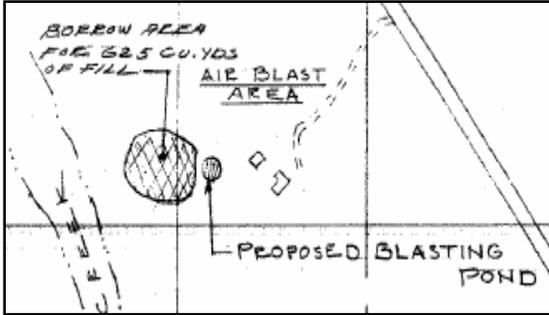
Air Blast Pond layout as depicted in 1998 RFI/VI
